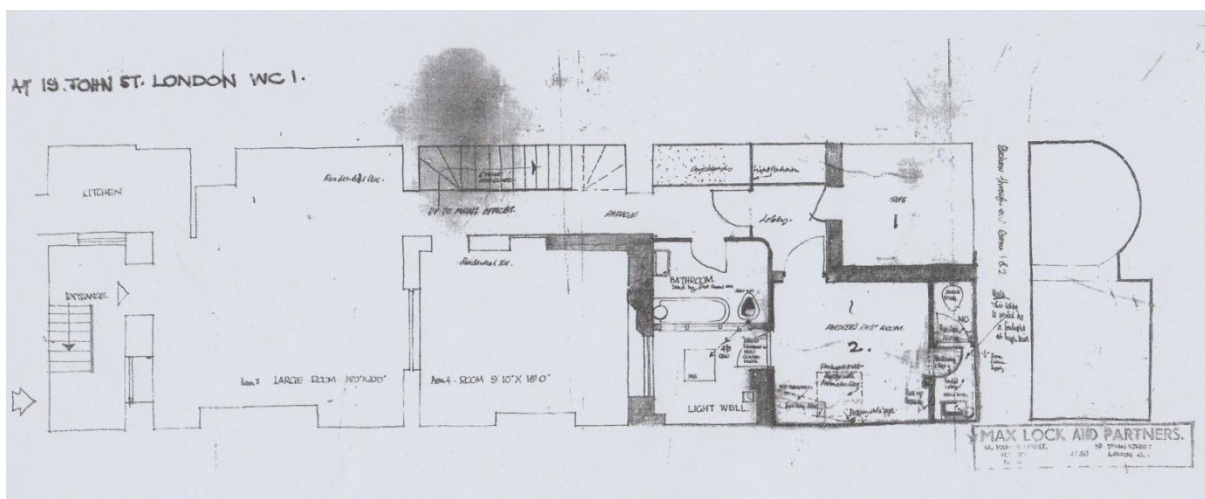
The basement plan in 1963 (Camden archives, drainage plans)
